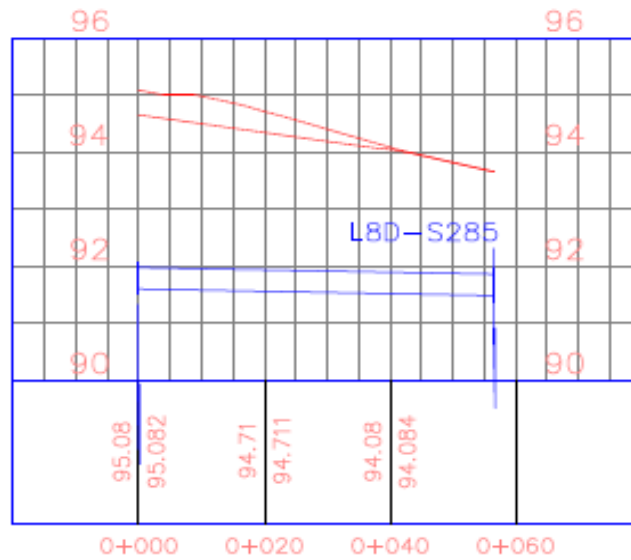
Elevation Profile of 375 mm Outtake Pipe at Hampton Place
